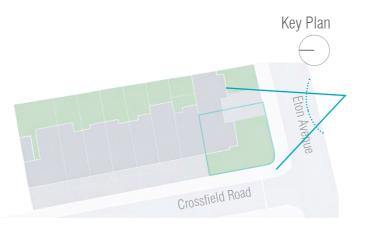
Photomontage view 1: from Eton Avenue Illustrating extension obscured behind garden wall
